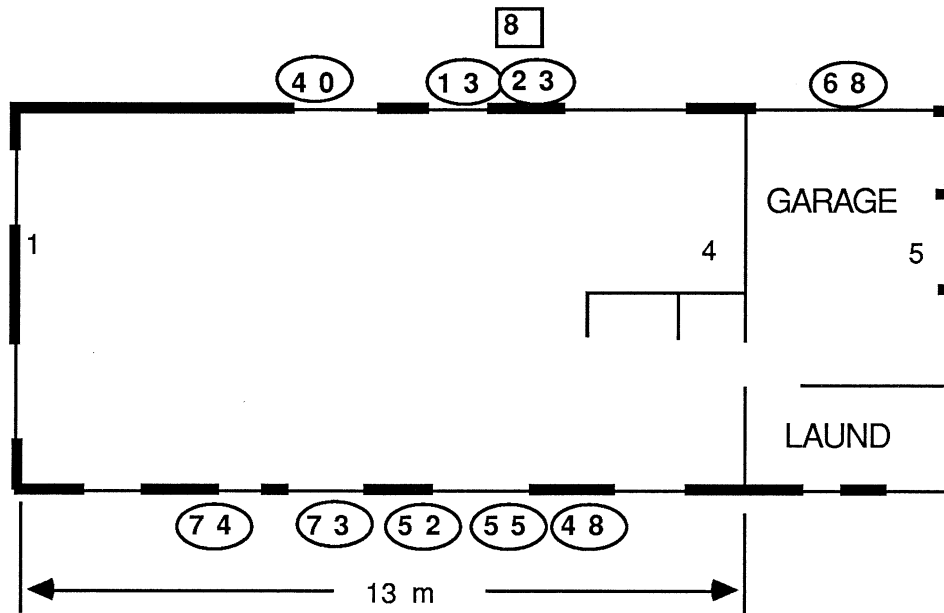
Nominal Plan after Removing Internal Wall Lining
